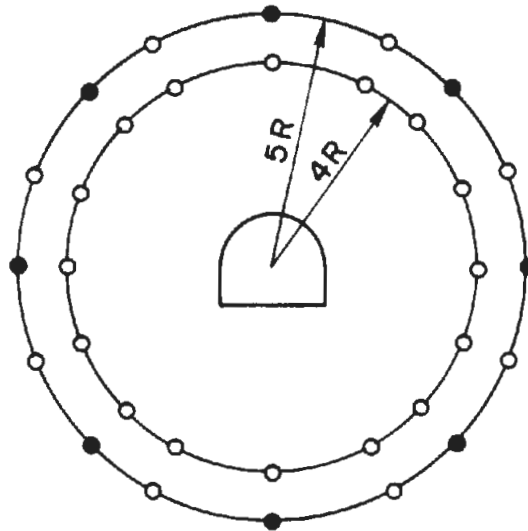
SCHEMATIC OF GROUTING ZONES USED FOR MAIN TUNNEL - SEIKAN PROJECT.
